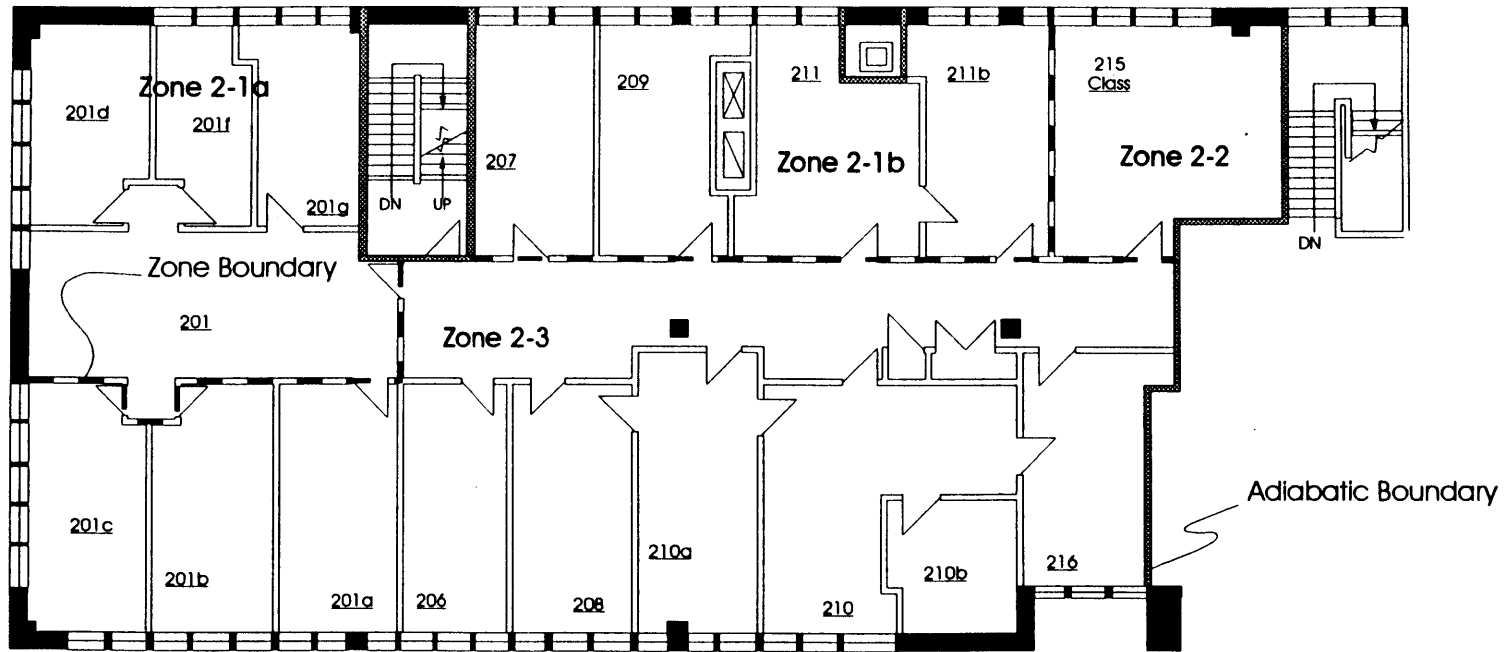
Building E51 - Second Floor Level Zoning Option 2A
